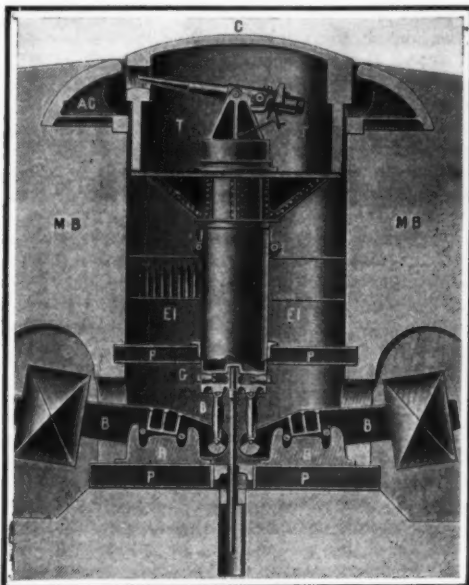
SECTION OF GALOPIN DISAPPEARING TURRET.
